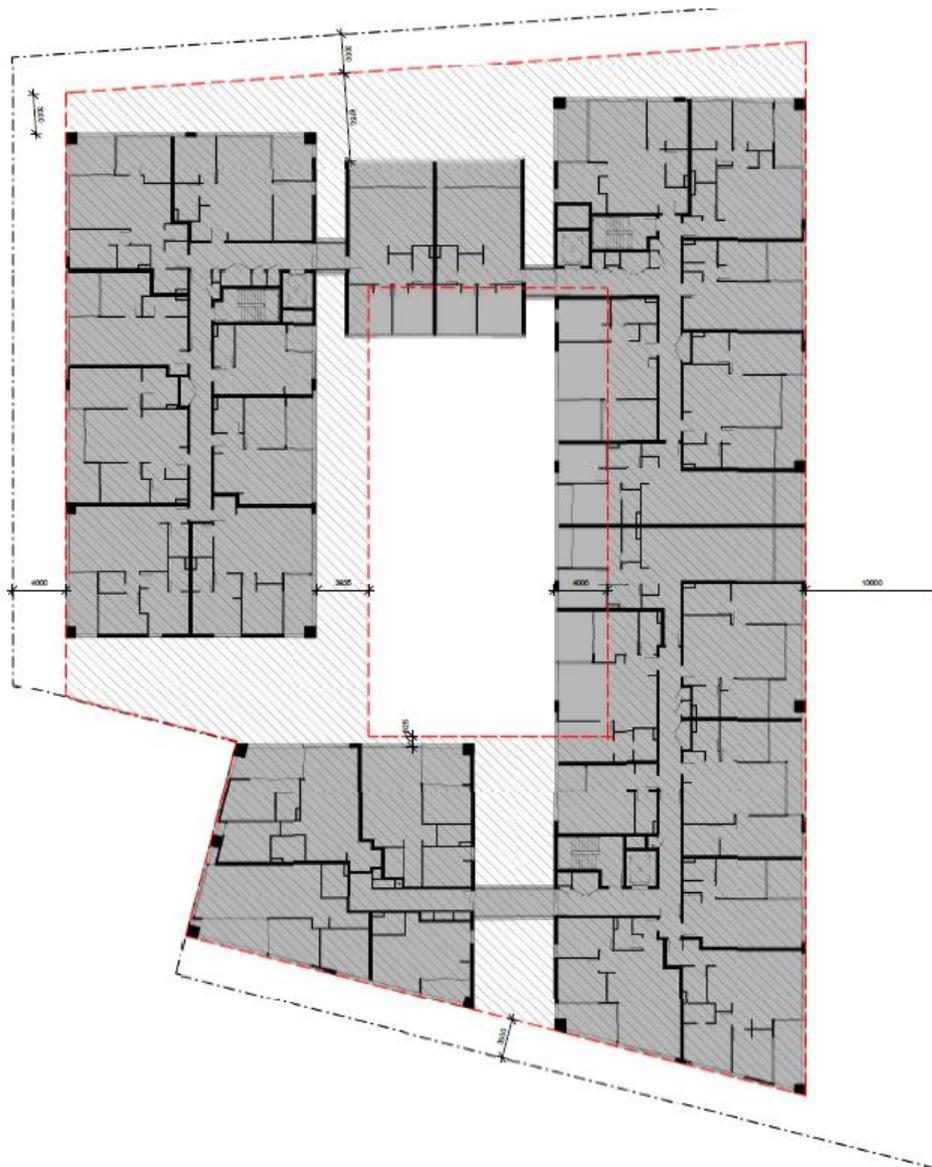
Proposed building footprint in grey as shown in relation to the approved building envelope (hatched)
